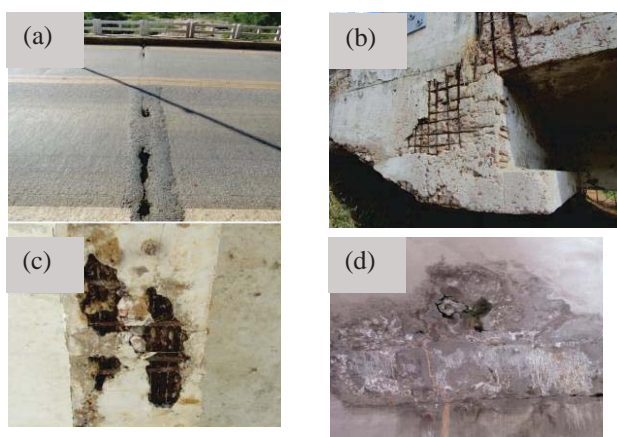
Examples of the main pathological manifestations found: (a) missing and/or damaged expansion joints (PM09); (b) concrete spalling/delamination (PM01); (c) reinforcement corrosion (PM02); (d) water infiltration (MP05) (Strata Eng.).
